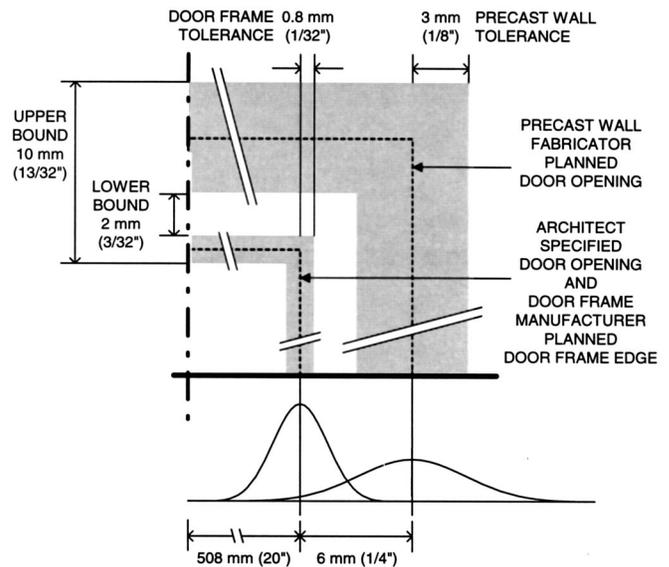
Tolerances on door frame and precast concrete wall
